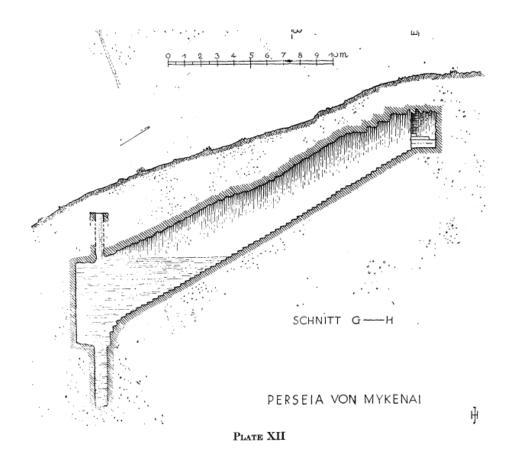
Section plan of the Perseia Tunnel (Karo, 1934: 126).
